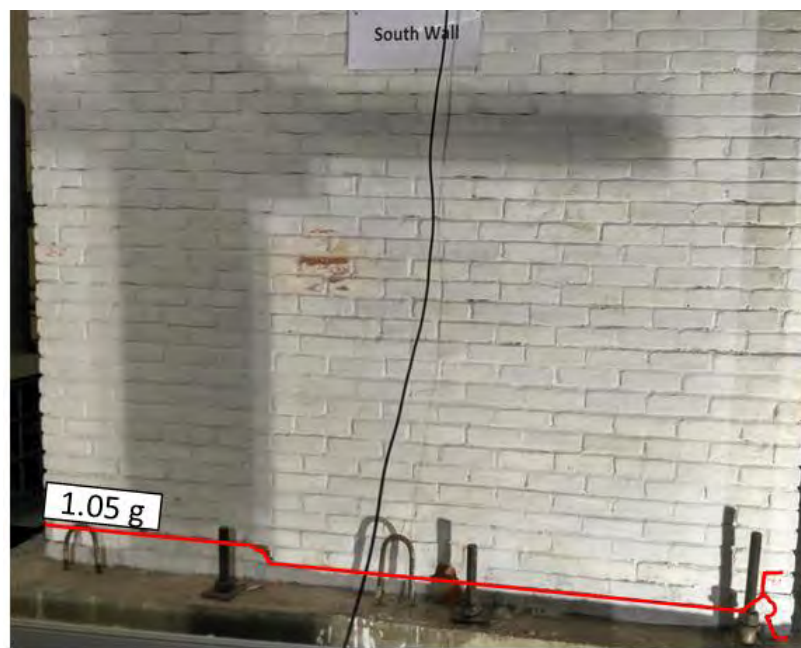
Cracks developed at 1.05g in south wall (in-plane wall)
